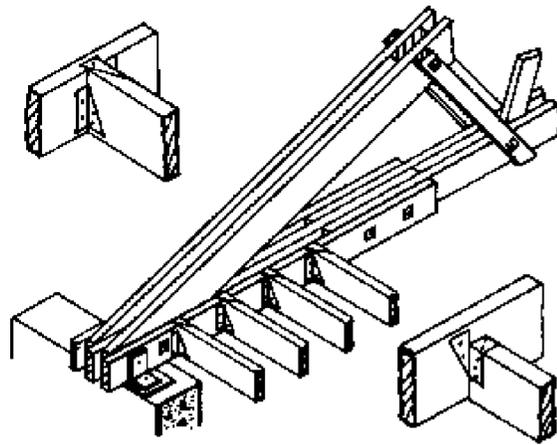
JOISTS FASTENED TO TRUSSES.
